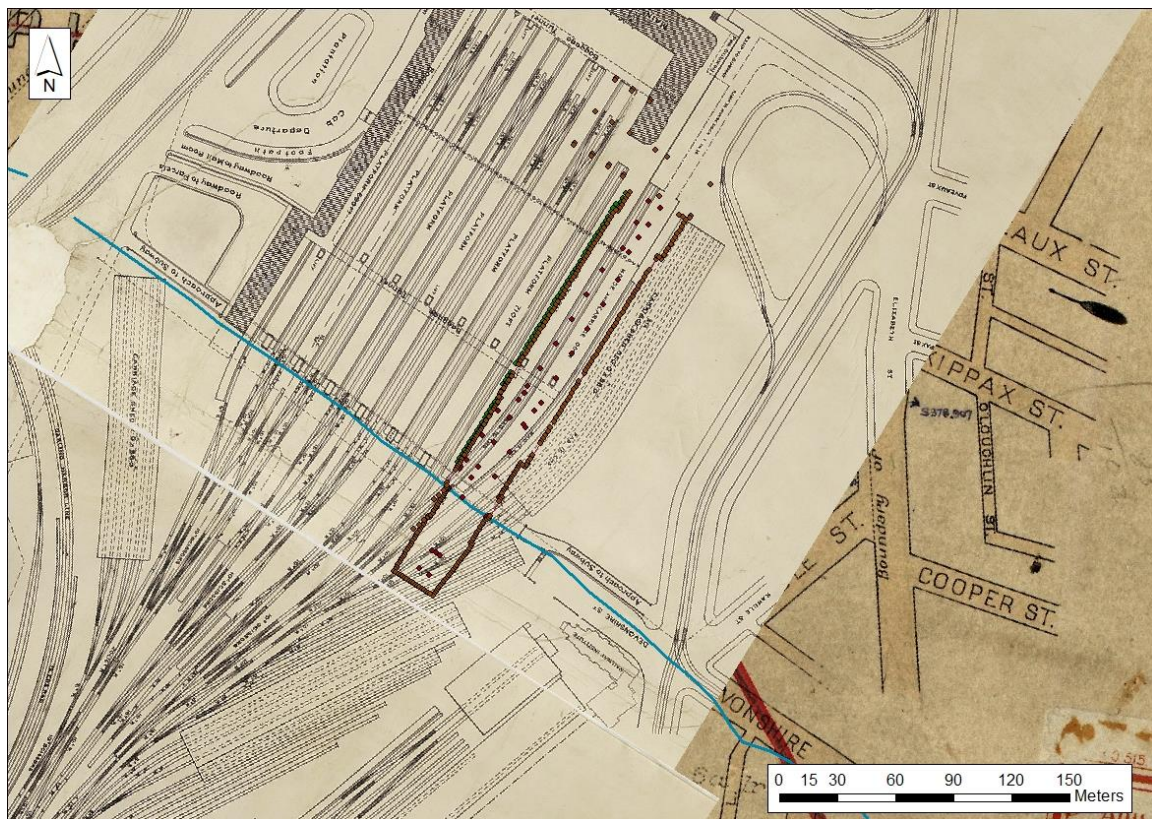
Central Station Main Works station box and enabling works overlain on the 1903 plan of Central Station
